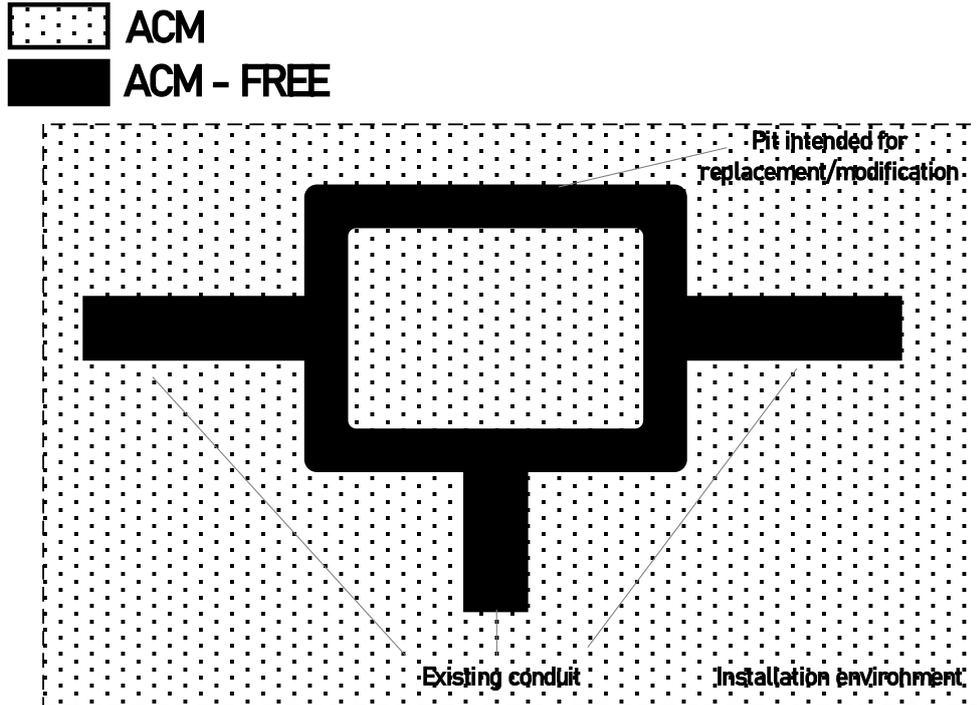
(c) – Scenario 3: ACM pits and conduits
